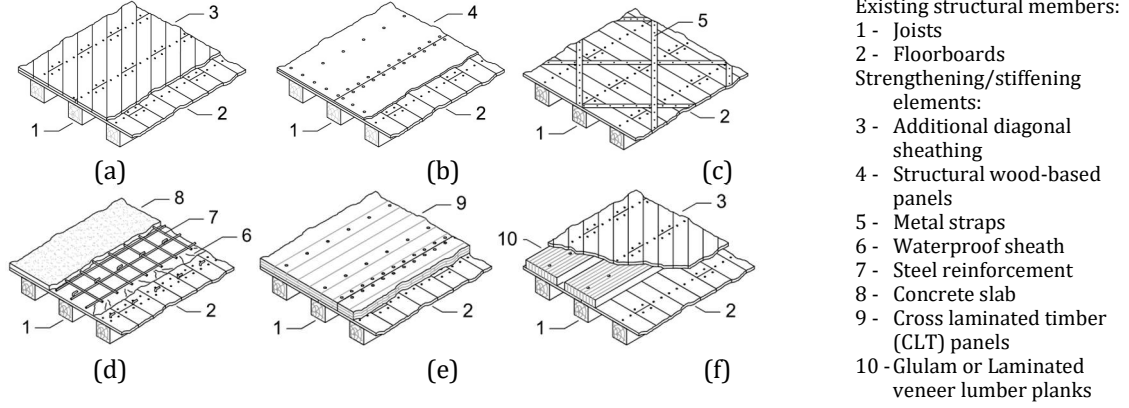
Retrofit: a) additional diagonal sheathing; b) structural wood-based panels; c) metal straps; d) concrete slab; e) CLT/LVL panels; f) timber planks and additional diagonal sheathing (adapted from [5])
